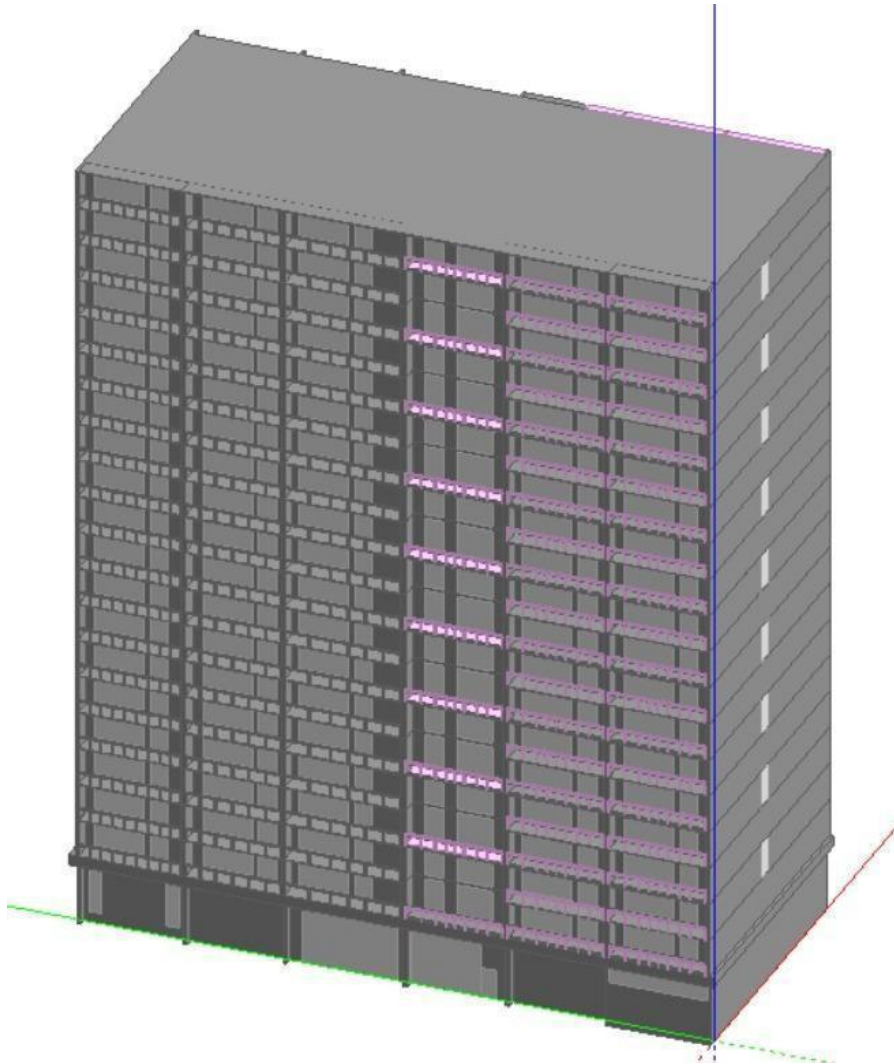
Geometry and Building Envelope of Sleaford Tower (Source: DesignBuilder)
